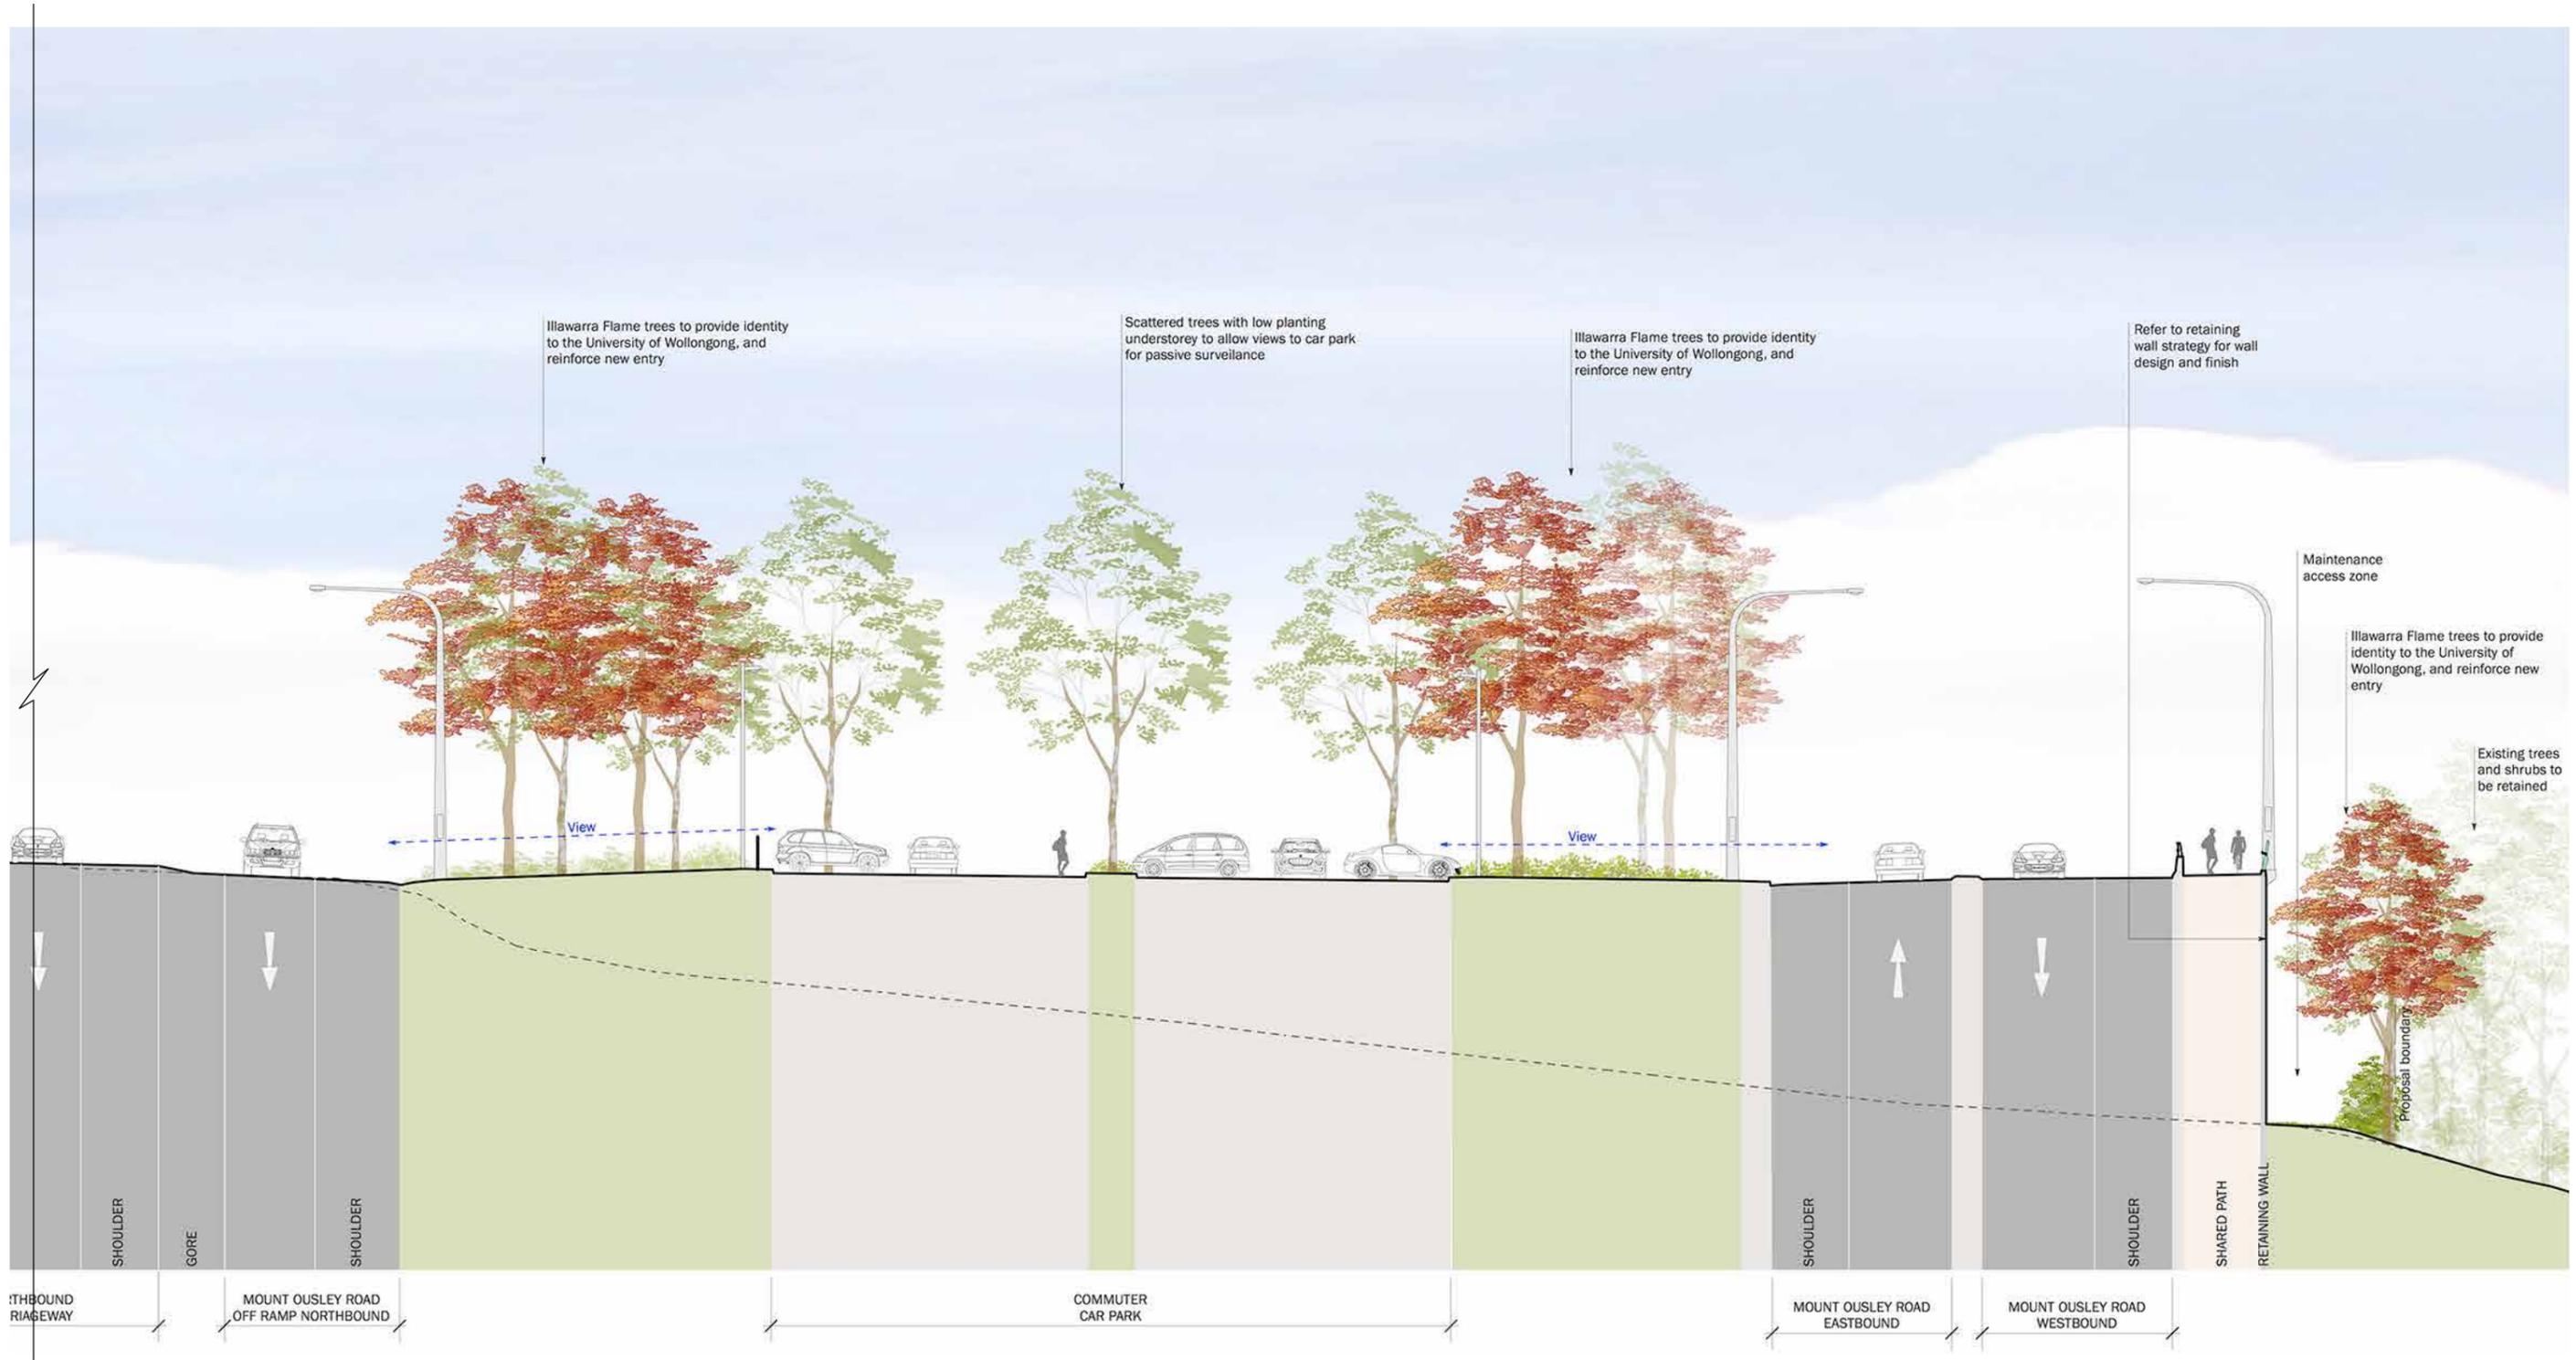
Section 2 through Princes Motorway west of Mount Ousley Road - Chainage 79200 (Scale 1:250)
